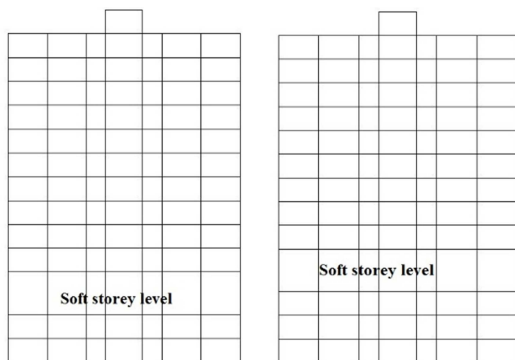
Elevation of (M-3). Figure 6 Elevation of (M-4).
